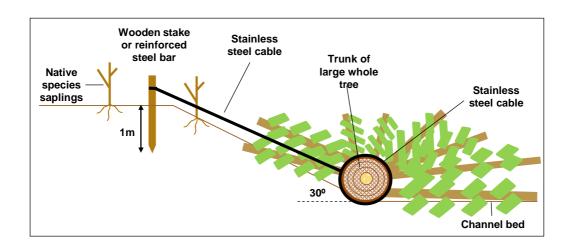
Cross-sectional view of large whole tree placement secured using steel cabling attached to loch anchors buried in the bank
